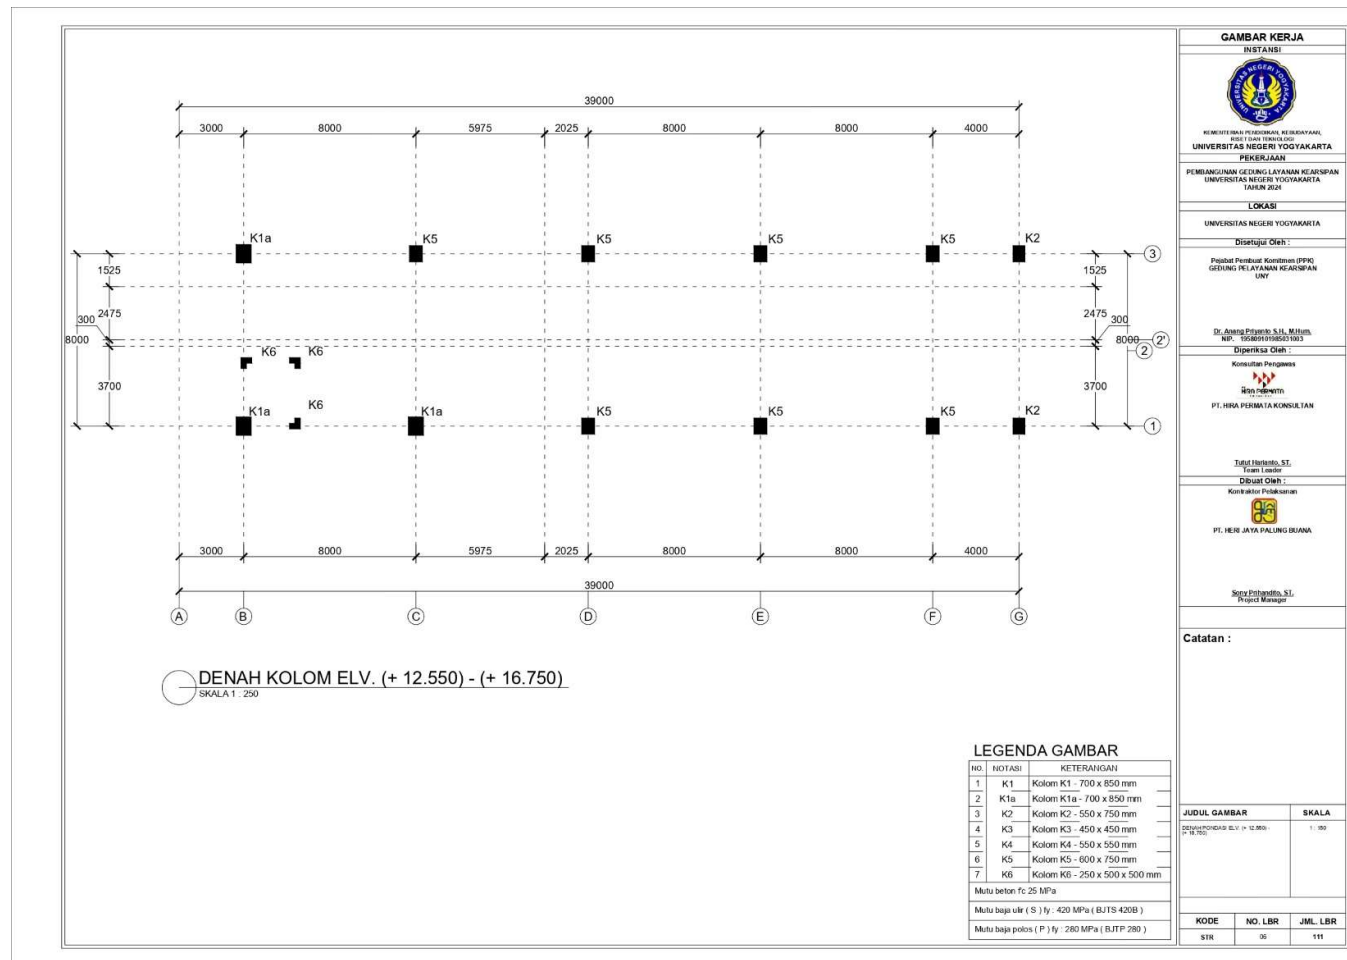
4 Column Site Plan of Elv. (+12.550) – (+16.750)
